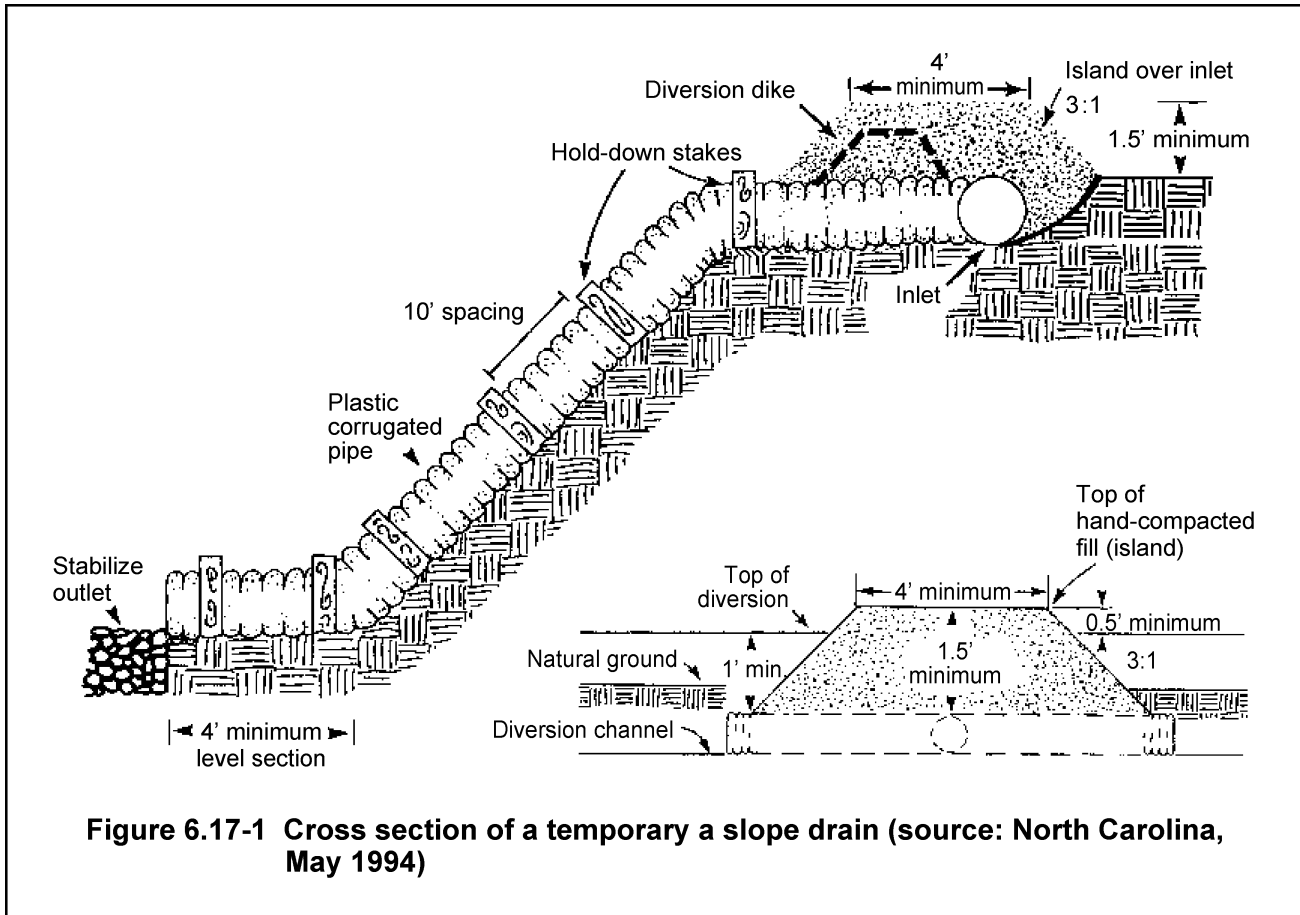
Cross section of a temporary a slope drain (source: North Carolina, May 1994)
